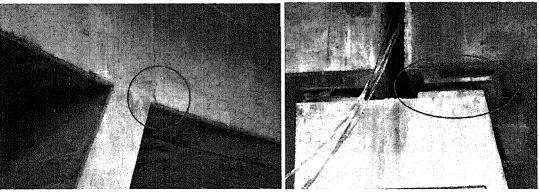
Cracks in the Taksin (Web of main girder)
